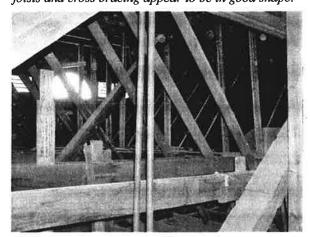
Extensive new framing was required to construct the dome and gables in 1912. It appears that at least part of the framing was salvaged from the original roof. The main trusses are the originals.
